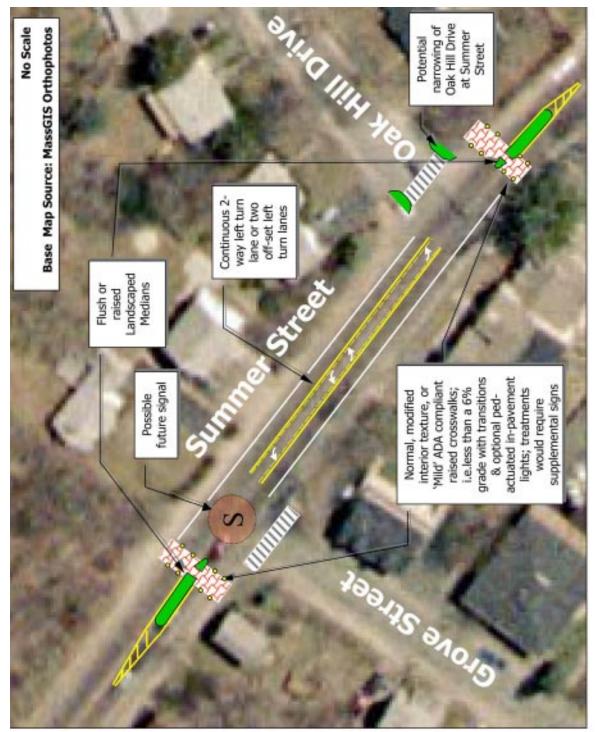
FST Potential Pedestrian Crossing/Calming Concept at Summer Street at Grove Street and Oak Hill Drive
